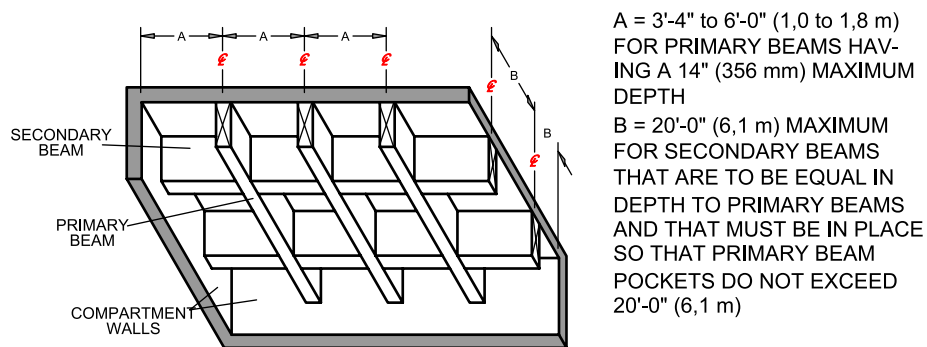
Primary Beam Spans Greater Than 20 ft.
